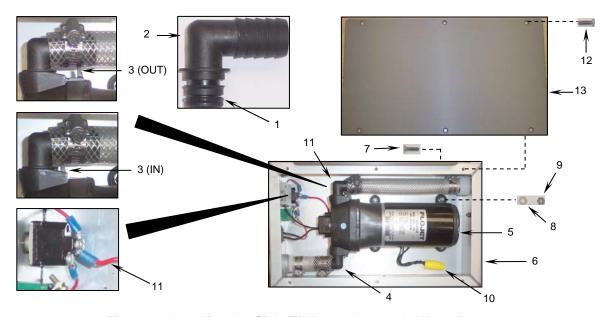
Installing the Sink Fill Pump Assembly Water Pump.
